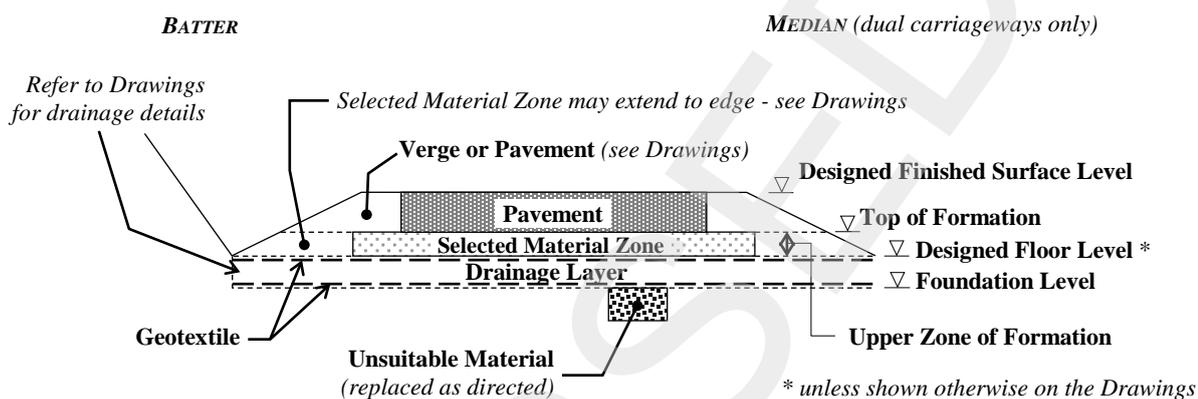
(d) – Cutting Floor Treatment Type C5 – Drainage Layer
